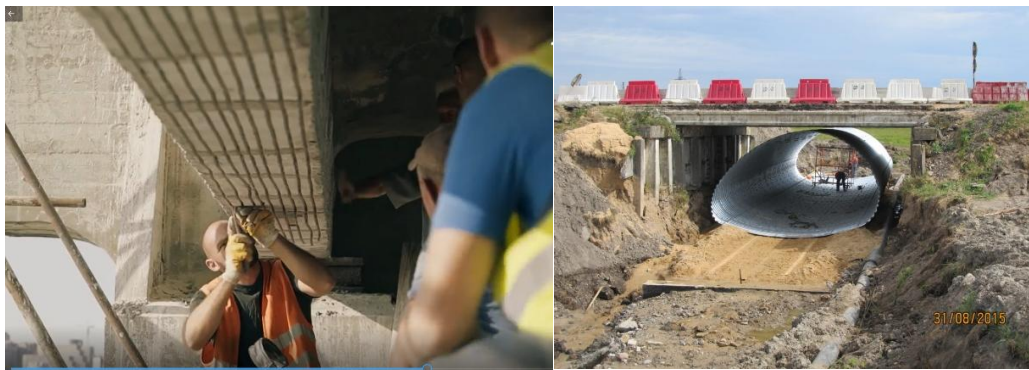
a) Application of carbon material for reinforcement during repair to strengthen reinforced concrete beams of the Central Bridge in the city of Dnipro, 2015; b) Repair of a single-span bridge by “sleeving” using the MultiPlate structure [1]
